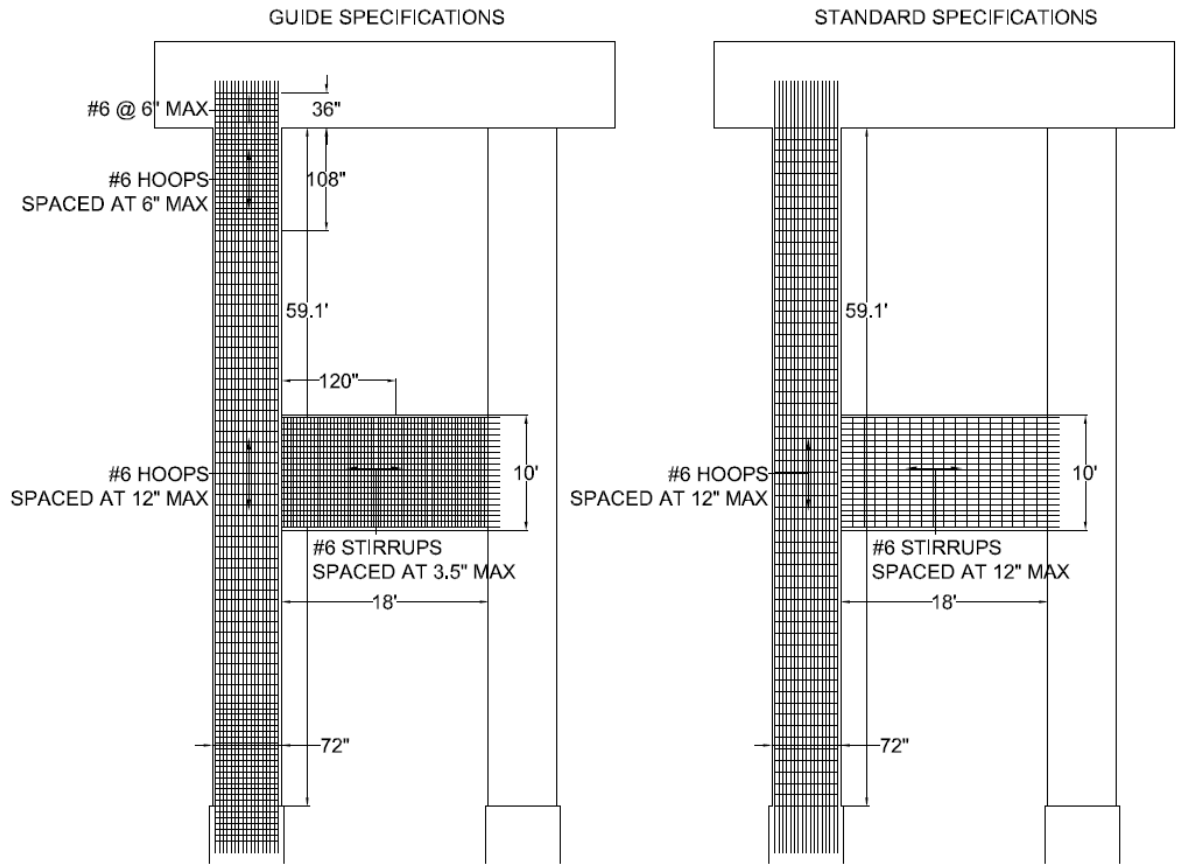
Scarham Creek Bridge Bent 3 Final Design Details
